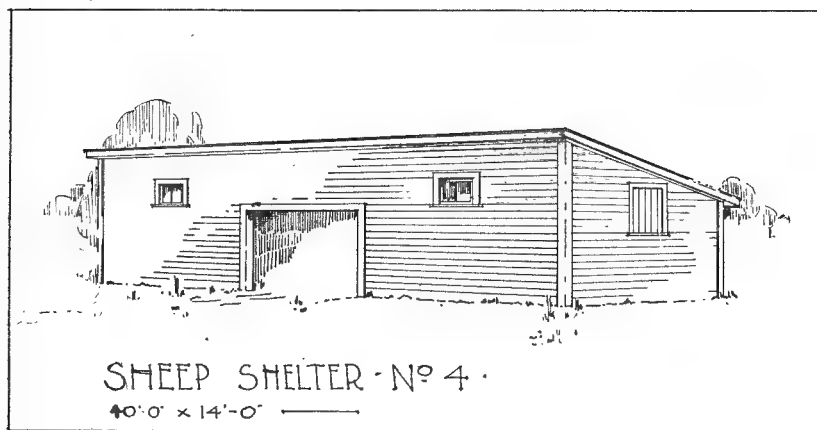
Simply a cheap summer shelter, though it could be used also for winter quarters.
